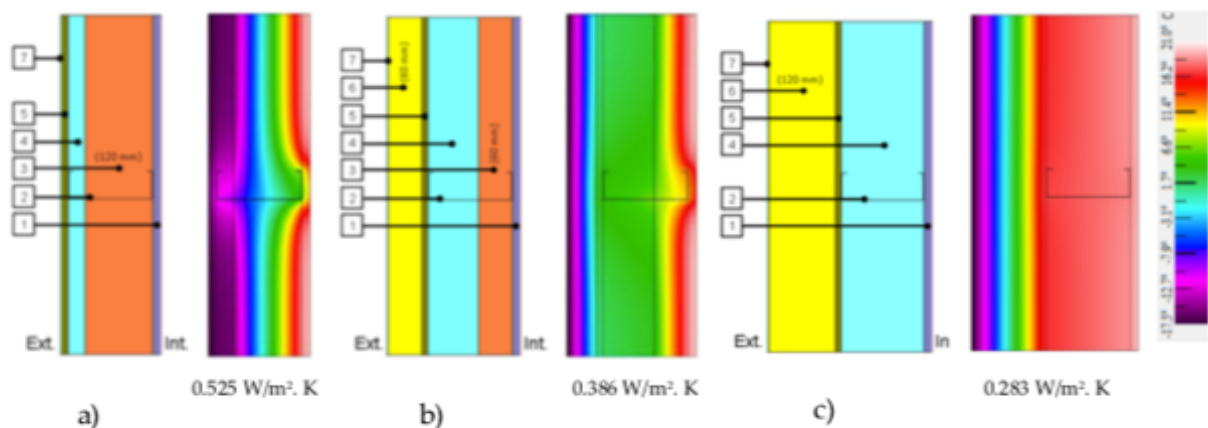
Cross section of a typical LSF wall (Rosa, 2018).
